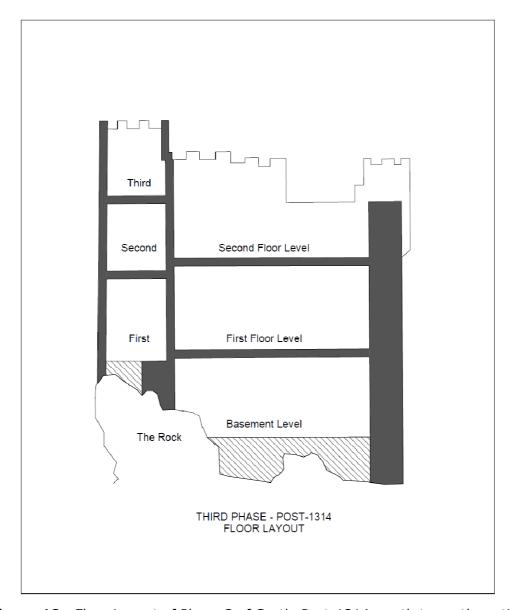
Floor Layout of Phase 3 of Castle Post-1314, north to south section
